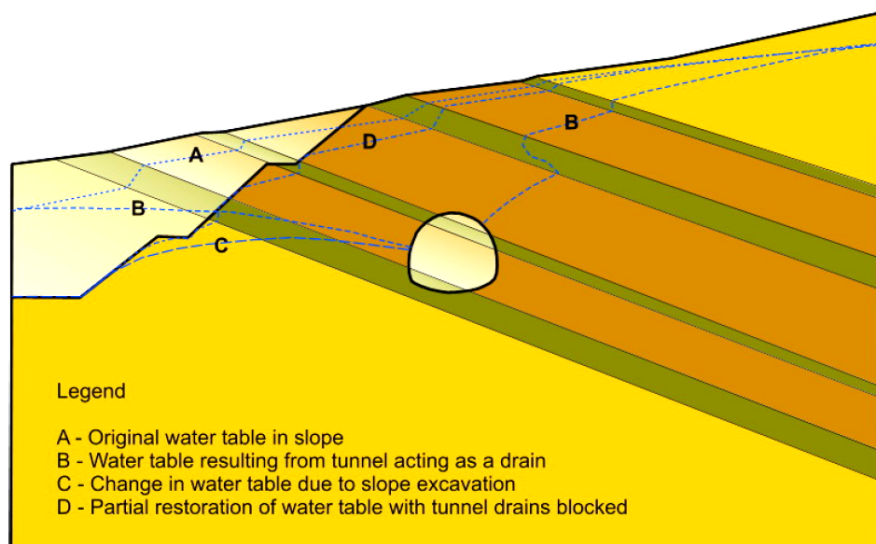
Water tables at different stages of tunnel and slope excavation and assuming long term blockage of the tunnel drains.
